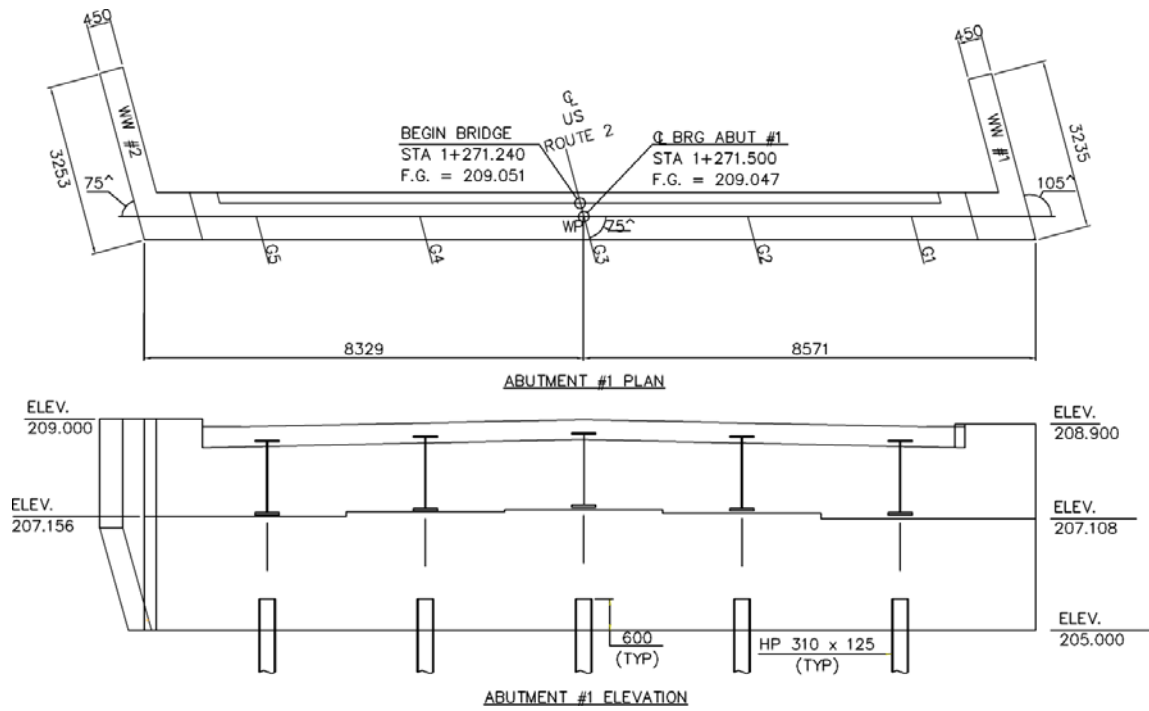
Plan and Elevation View of Abutment 1 at East Montpelier Bridge
